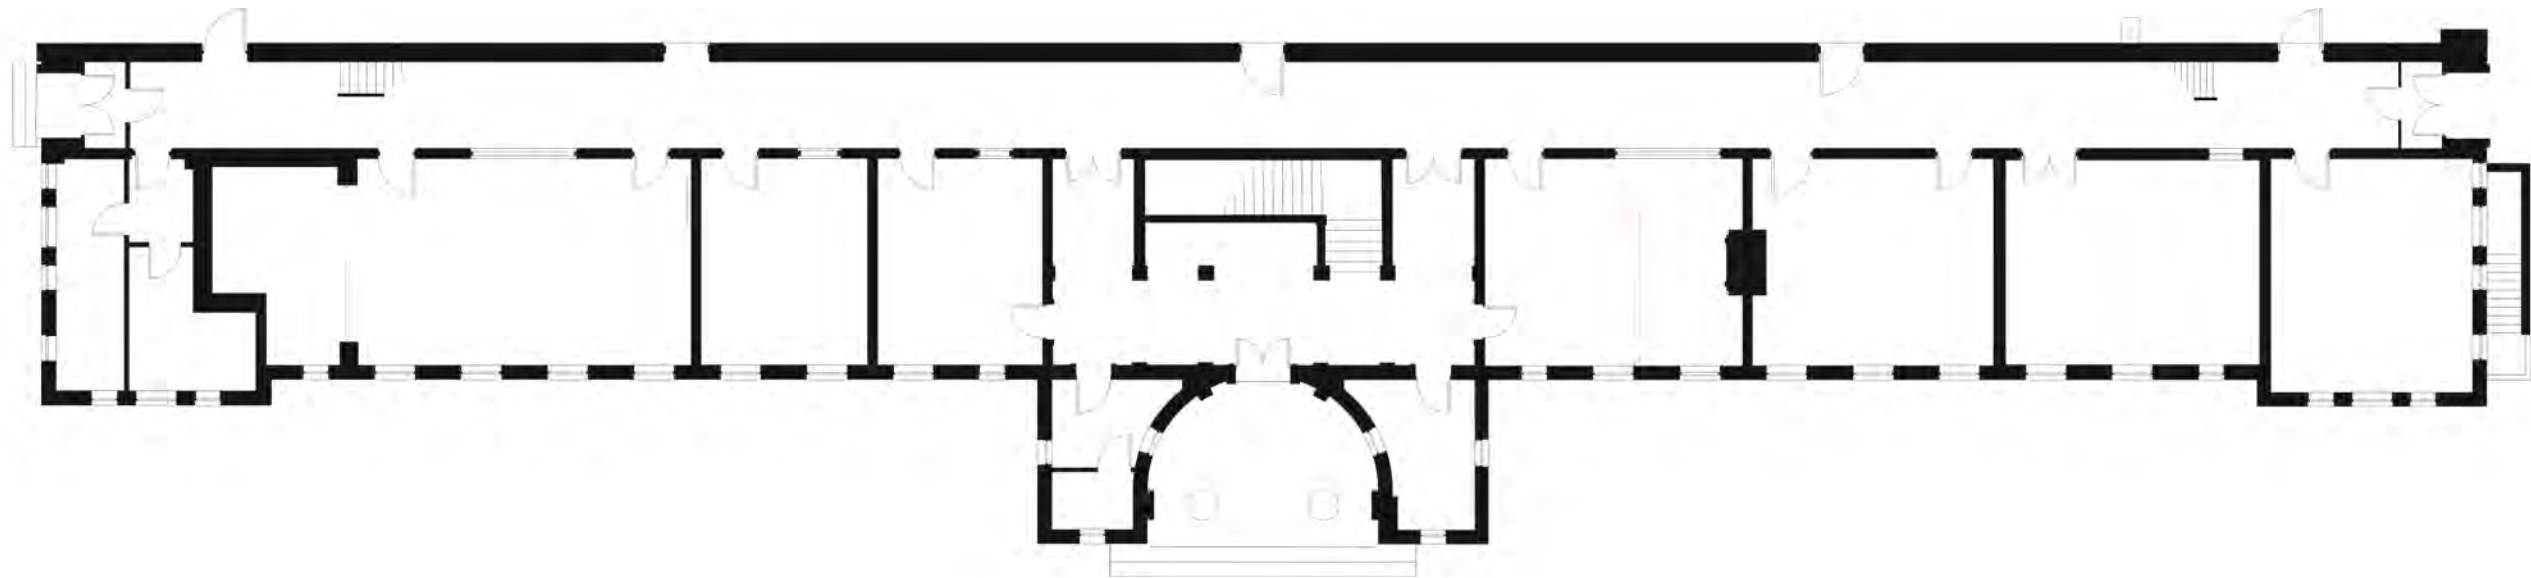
Ground Floor As Constructed, 1:200 @ A3
